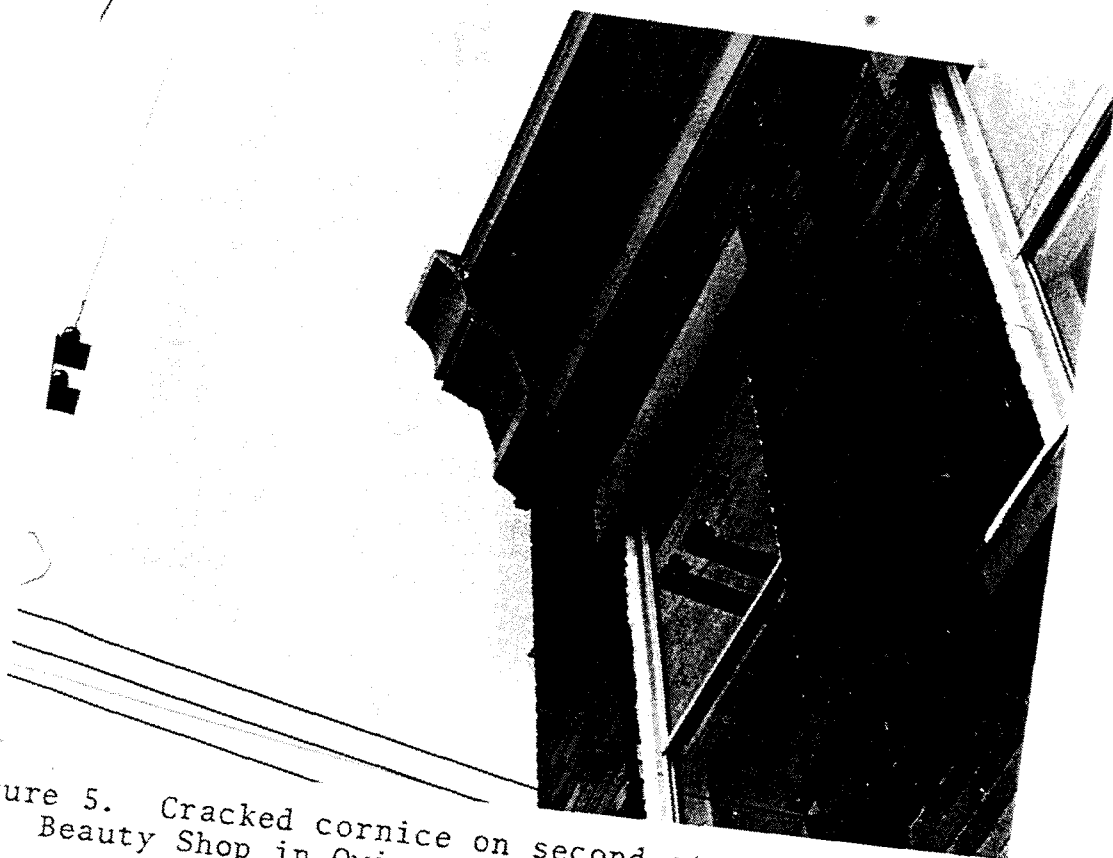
Cracked cornice on second story of Perfect Lady Beauty Shop in Owingsville, KY.
